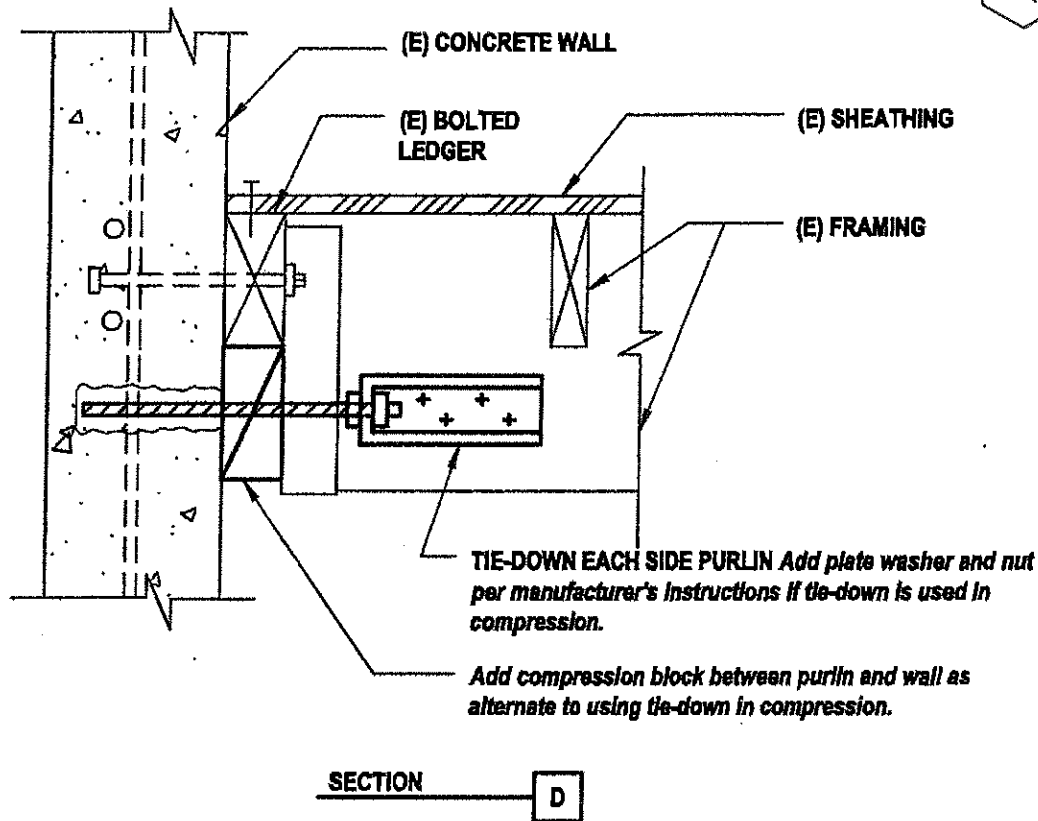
D: Wall Out-of-Plane Anchorage for Flexible Wood Diaphragm at Purlins
